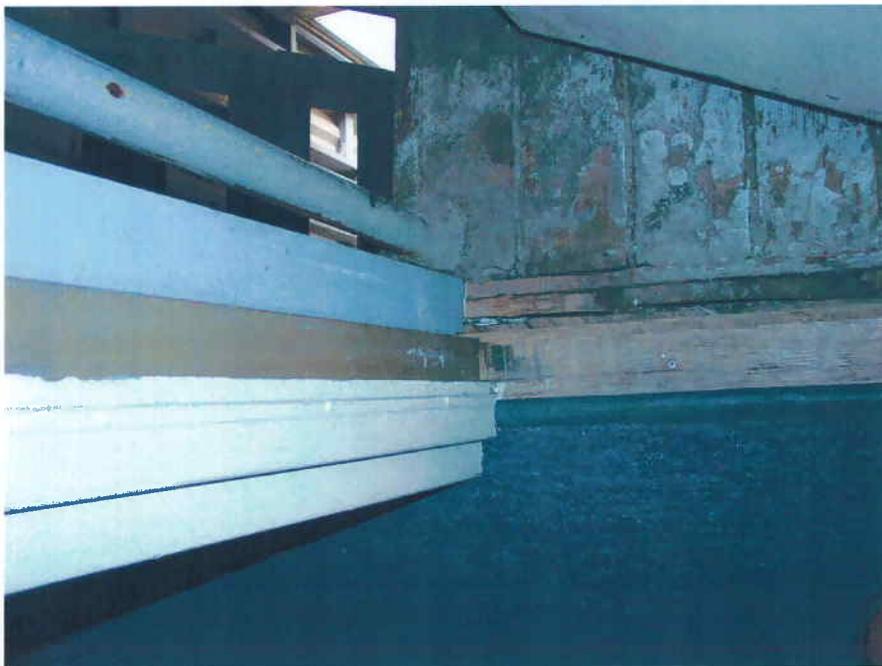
Exterior stair tower, threshold at exit door - Hangars 2 & 3.
